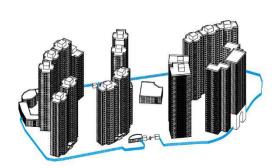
Figure ground plan and axonometric of Pujiang Mingdi (see chapter 5.2)Fig. 3.1.3.2 Tower block Zhongyuan Liangwancheng 2018Fig. 3.1.3.3 Plaza inside the tower block Pujiang Mingdi 2018
